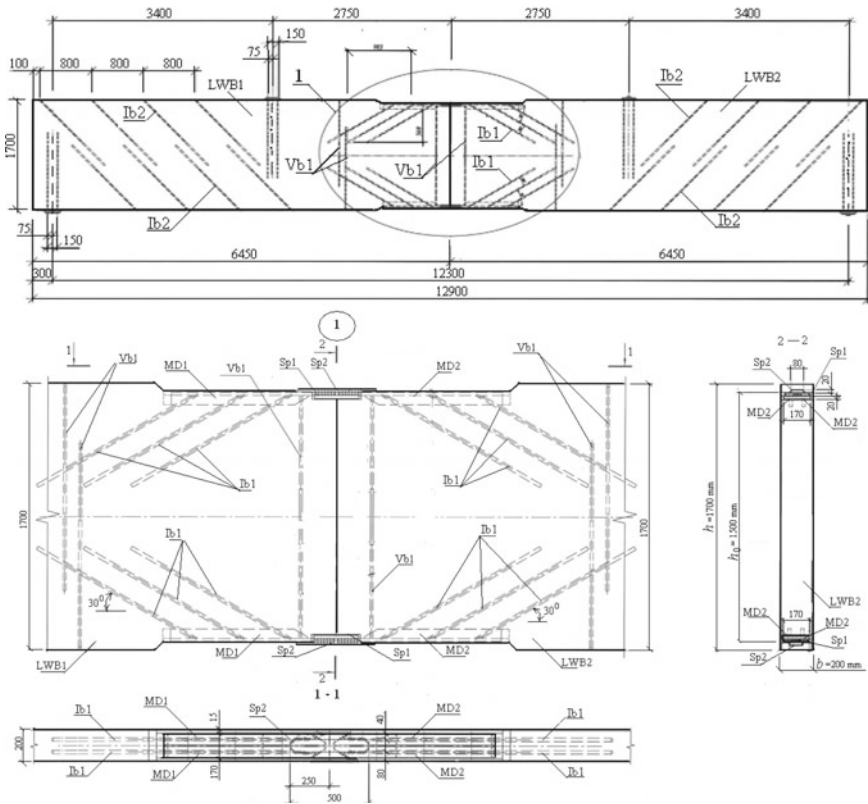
Scheme of a rigid joint specimen made using unidirectional inclined glued-in rods. LWB1 and LWB2—glued laminated timber elements; Sp1 and Sp2—connecting steel plates; MD1 and MD2—anchored plates; Vb1—vertical reinforcing bars; Ib1 and Ib2—inclined reinforcing bars
